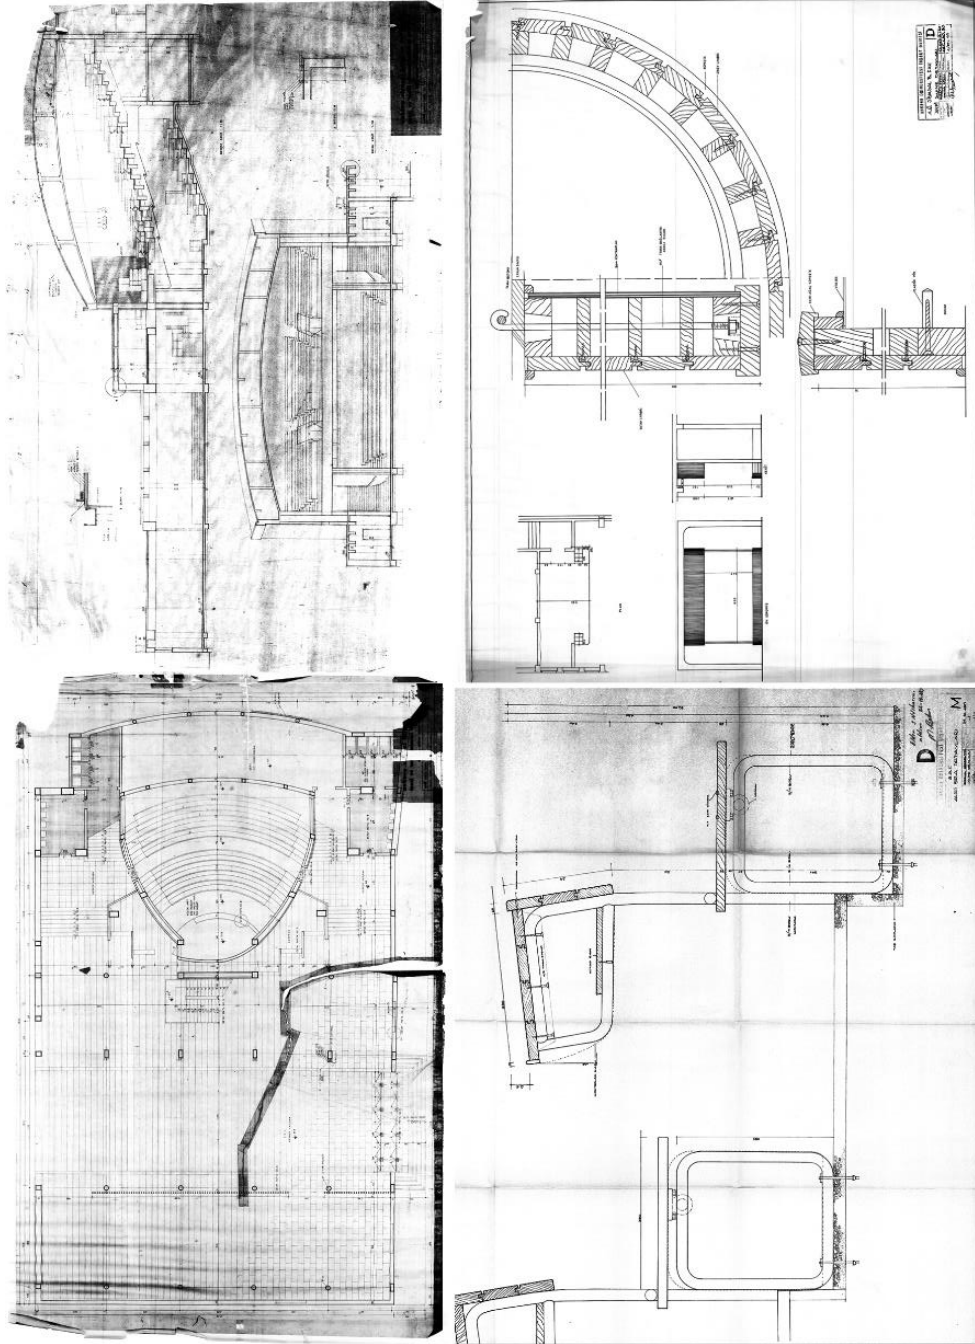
Original plan, section and detail drawings (sitting units and the stage) of the amphi building (archive of Ankara University Directorate of Construction and Technical Works)
